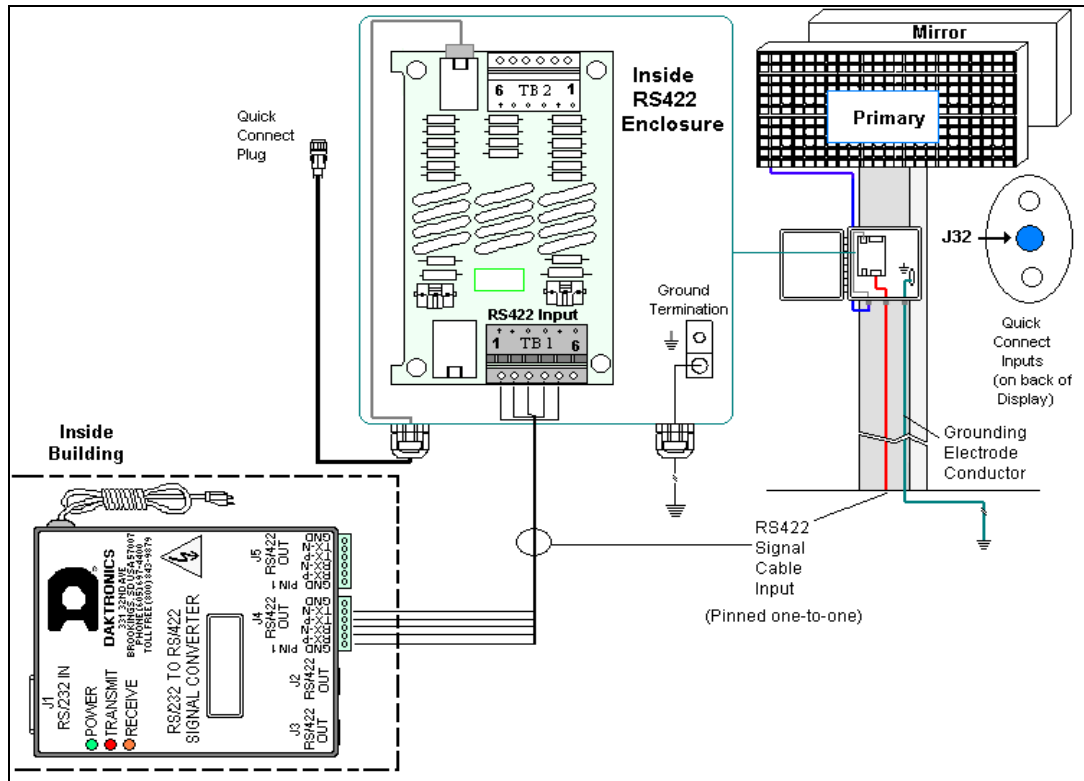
Signal Converter to Surge Board Assembly Enclosure
